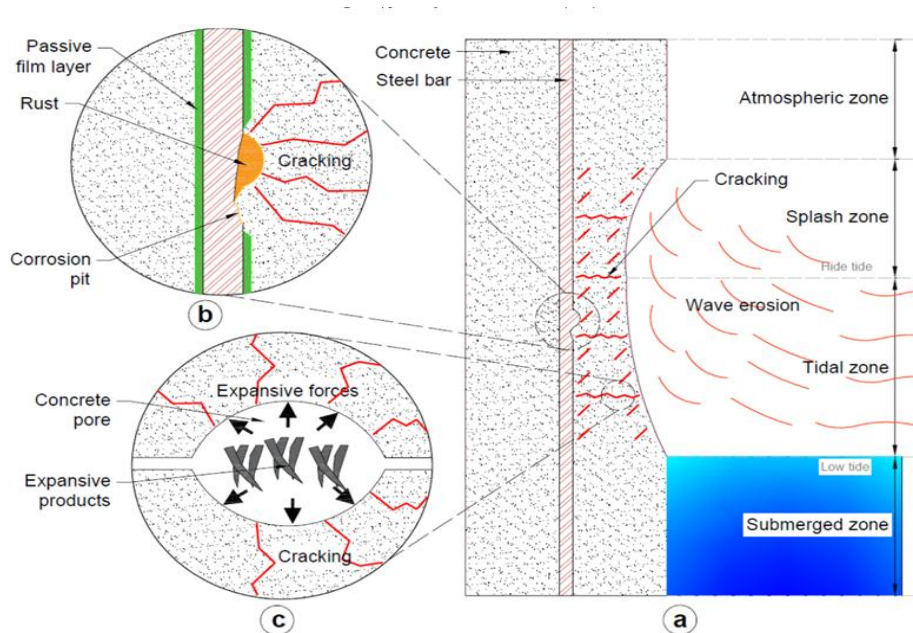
Concrete exposed to deterioration in marine environment: (a) Element of concrete structure, (b) steel corrosion and (c) damage by expansion (Mehta and Monteiro, 2006)
